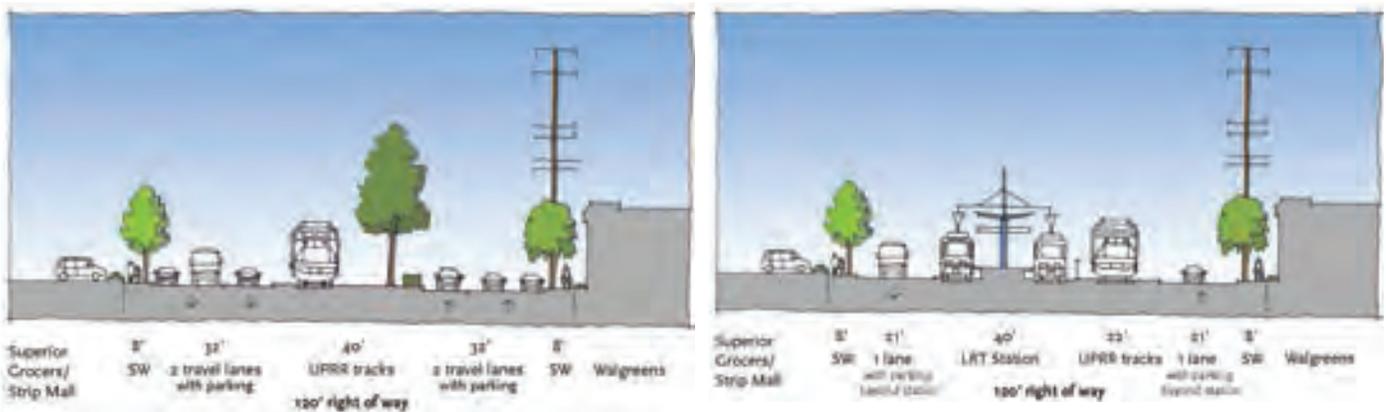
(L) Existing cross-section of Randolph Street (looking east) Figure 2-16 (R): Conceptual cross-section for a center platform station on Randolph Street (looking east)
